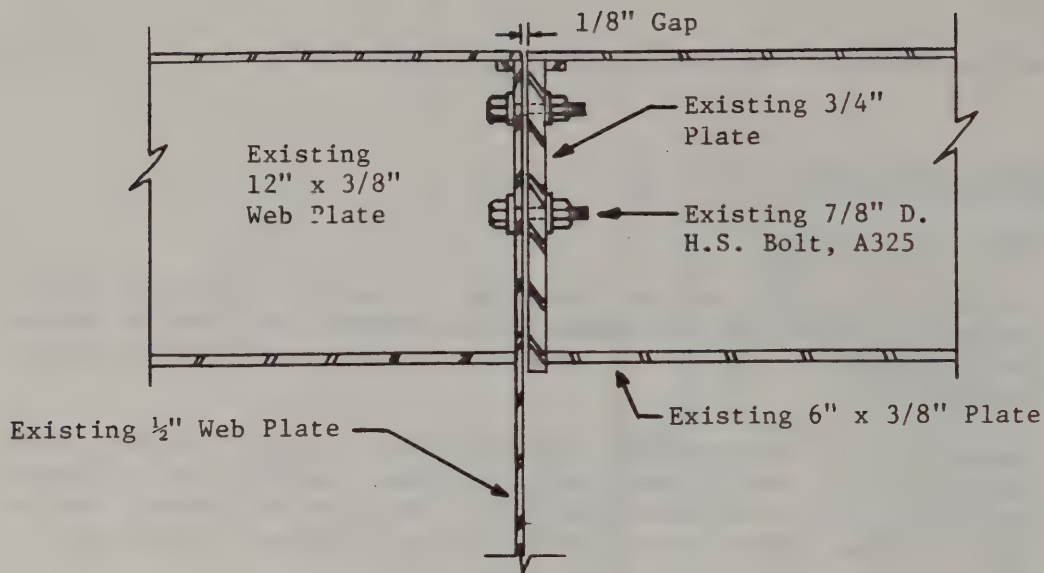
TRANSVERSE DETAIL BEFORE STIFFENING
